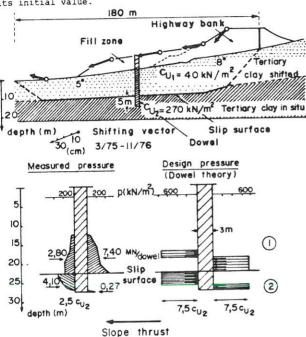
STABILIZATION OF SLIDING SLOPE (Sommer, 1979)
